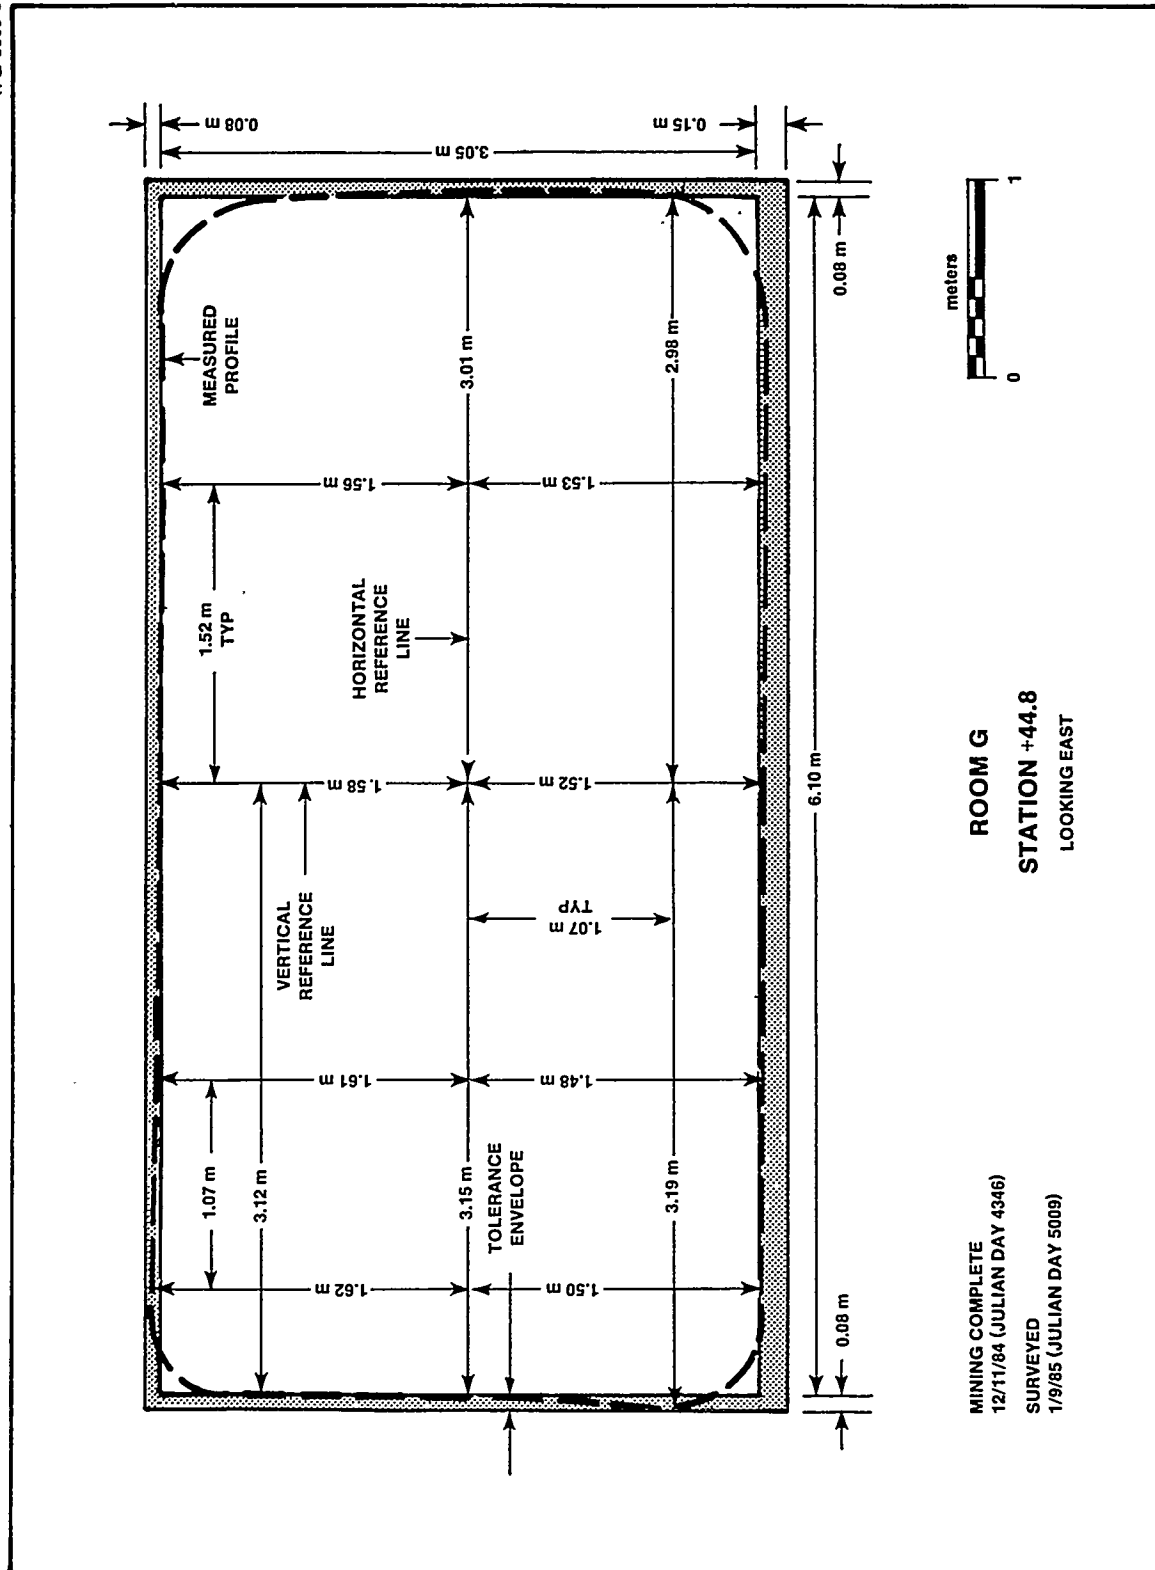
As-Built Cross Section of Station +44.8 m, Room G
